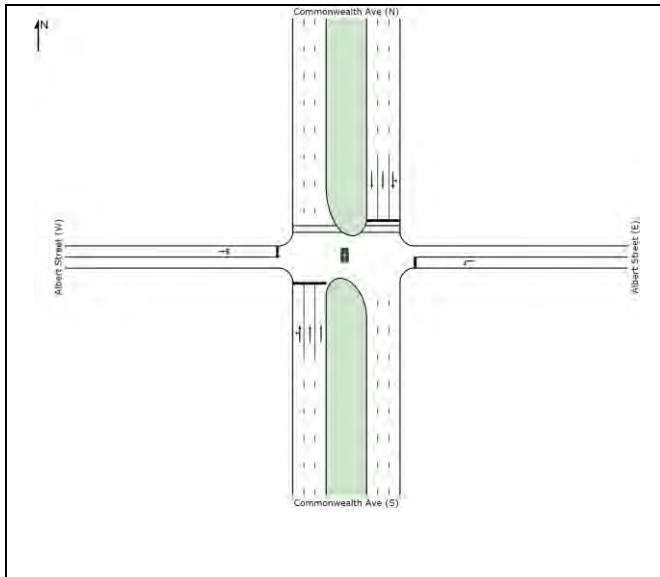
Variant 2c Commonwealth Avenue – Albert Street Intersection
